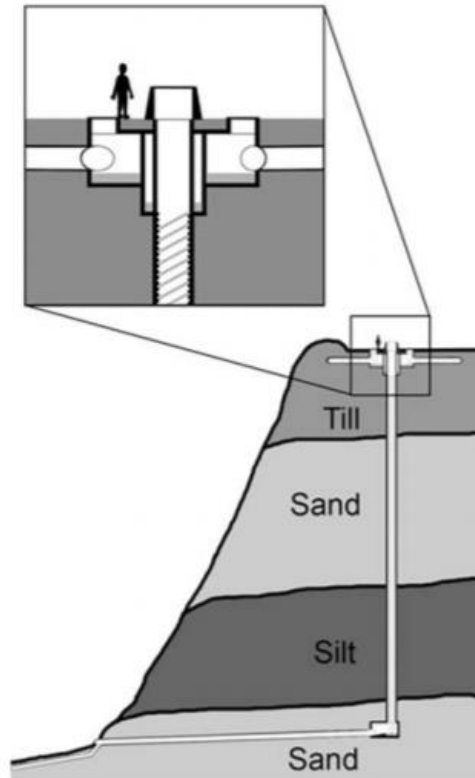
Sectional Diagram of Spiral Drain, Outfall and Inlets
